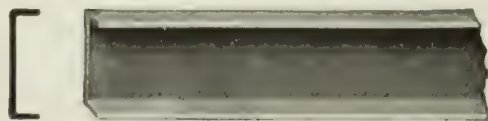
HAVEMEYER COLD FORMED CHANNEL
